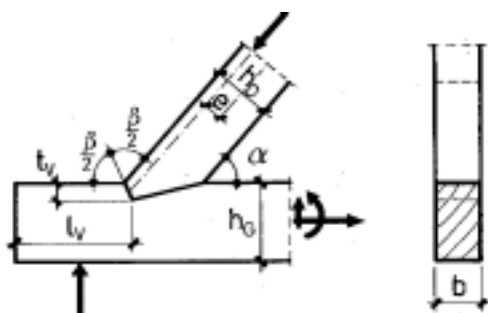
Tie beam-rafter-joint, used in older and modern constructions
